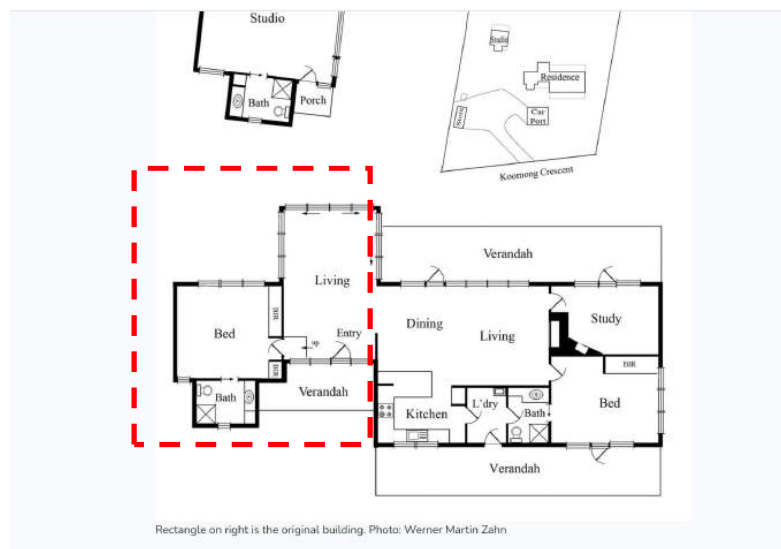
Floor plan shows the late 1990s addition. Koornong Crescent is located on the bottom. Source: Carson House, Alistair Knox Foundation.
